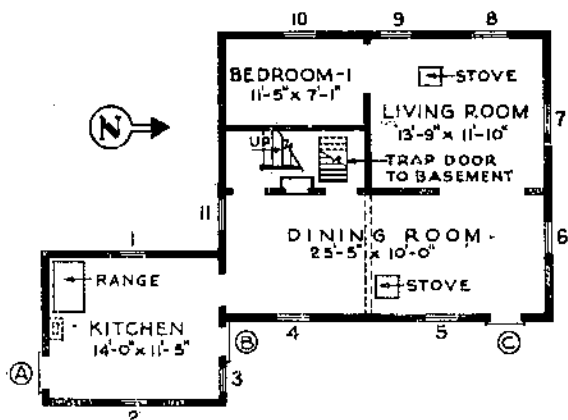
First-floor plan of house No. 6, showing location of heating and cooking equipment.
